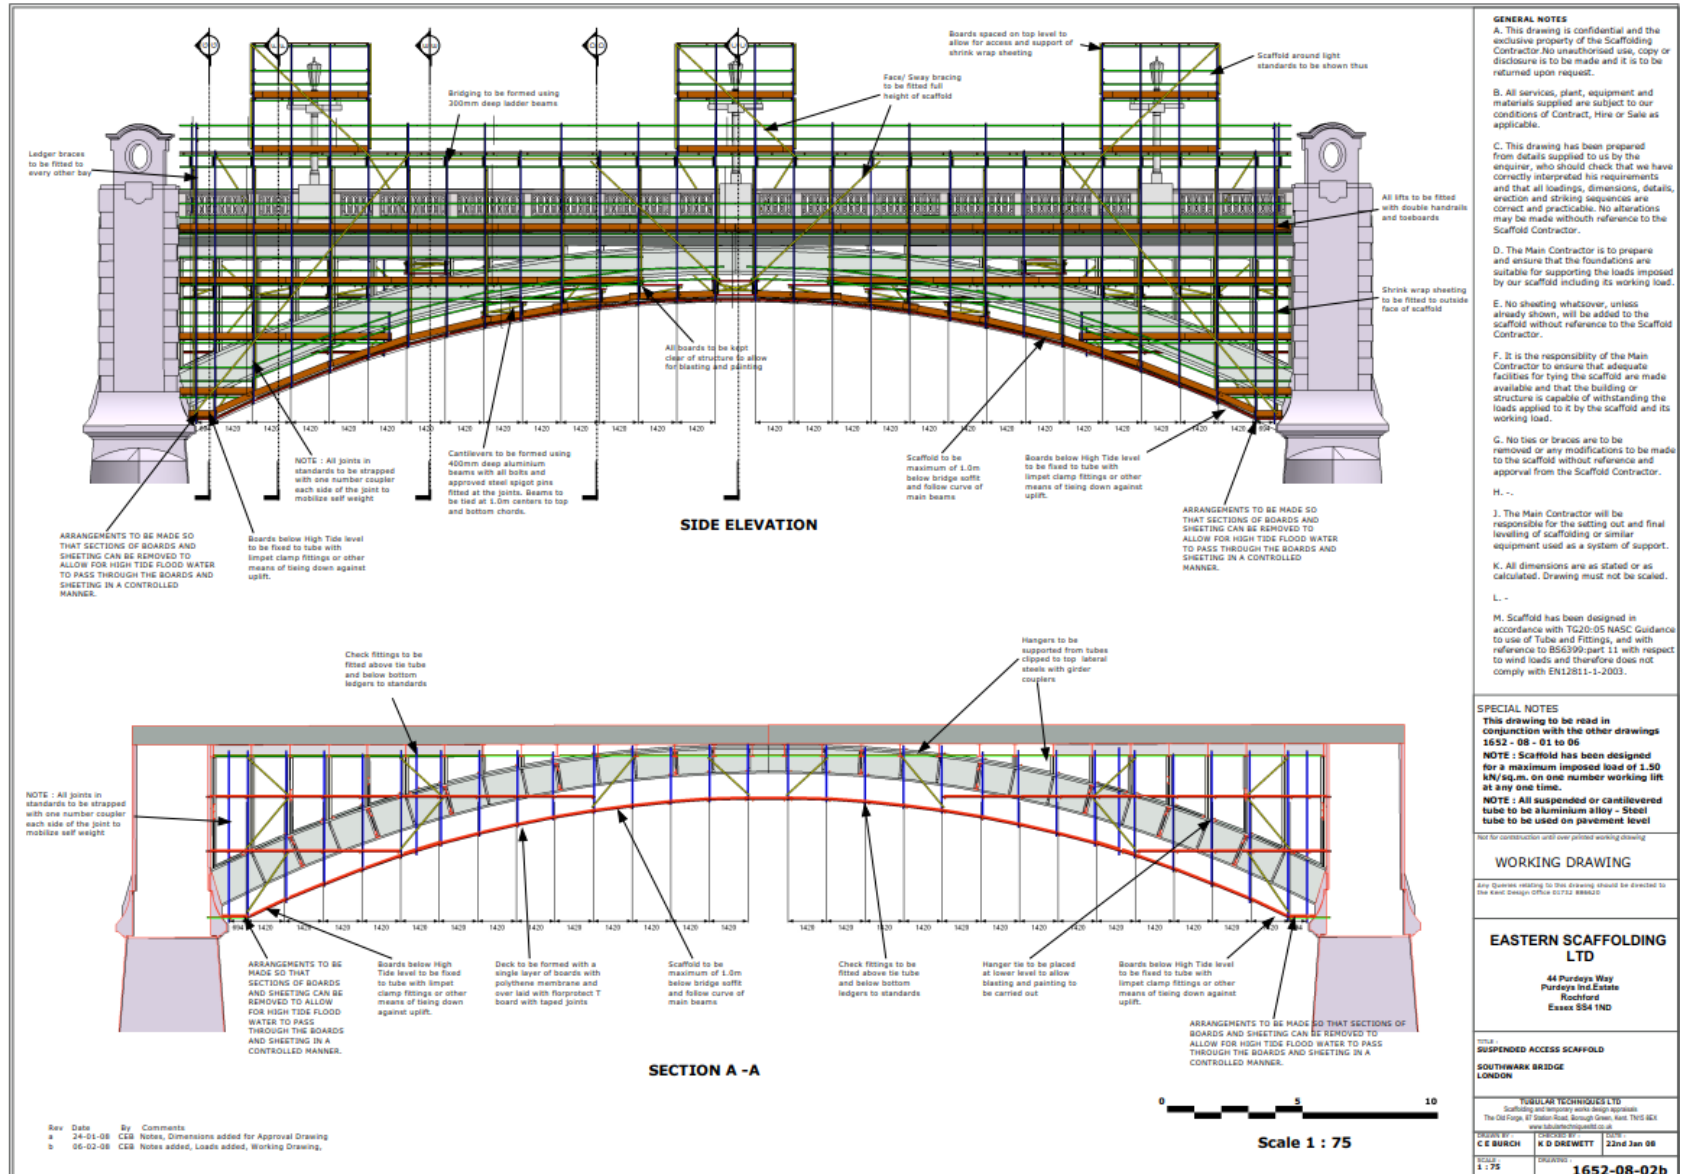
Scaffolding used on Southwark Bridge [2/6]
